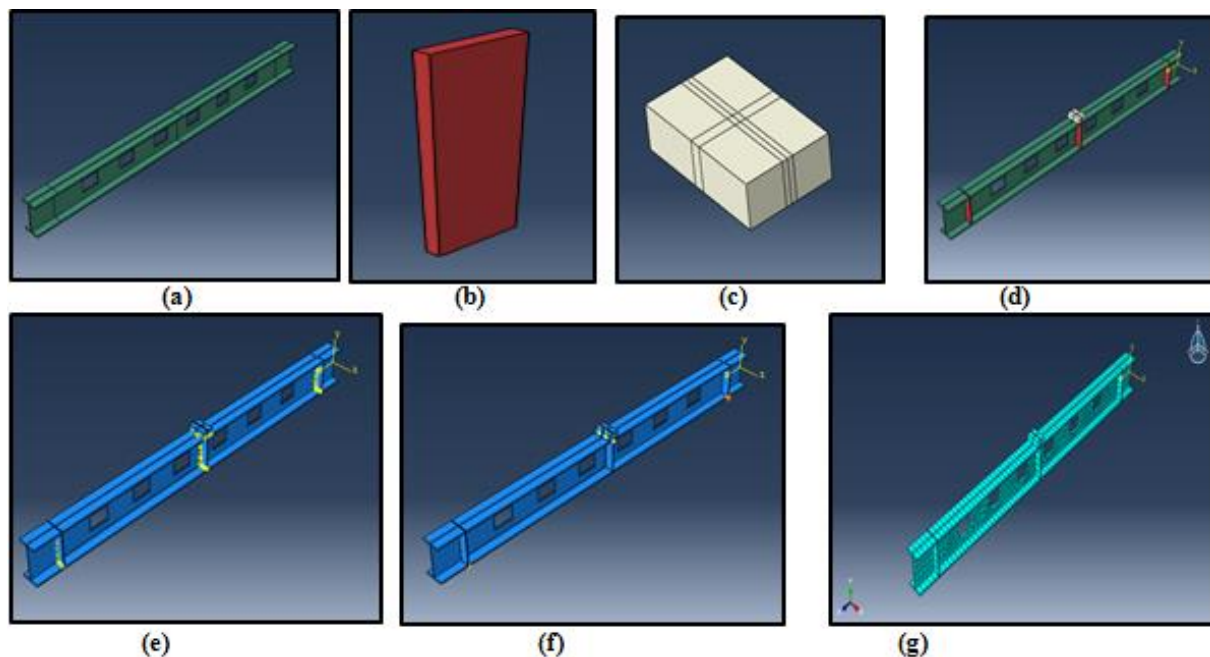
Representation of steel I beams with web openings (a) steel beam (b) stiffeners (c) load support (d) assembling of part instances (e) steel beams with tie constraint (f) steel beam with load and boundary condition (g) mesh formation of steel beam
